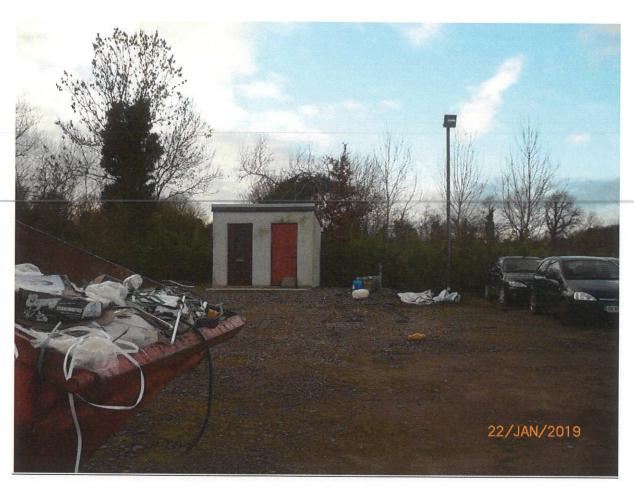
Shed adjacent to Timber Cabin & Unauthorised Car Parking
